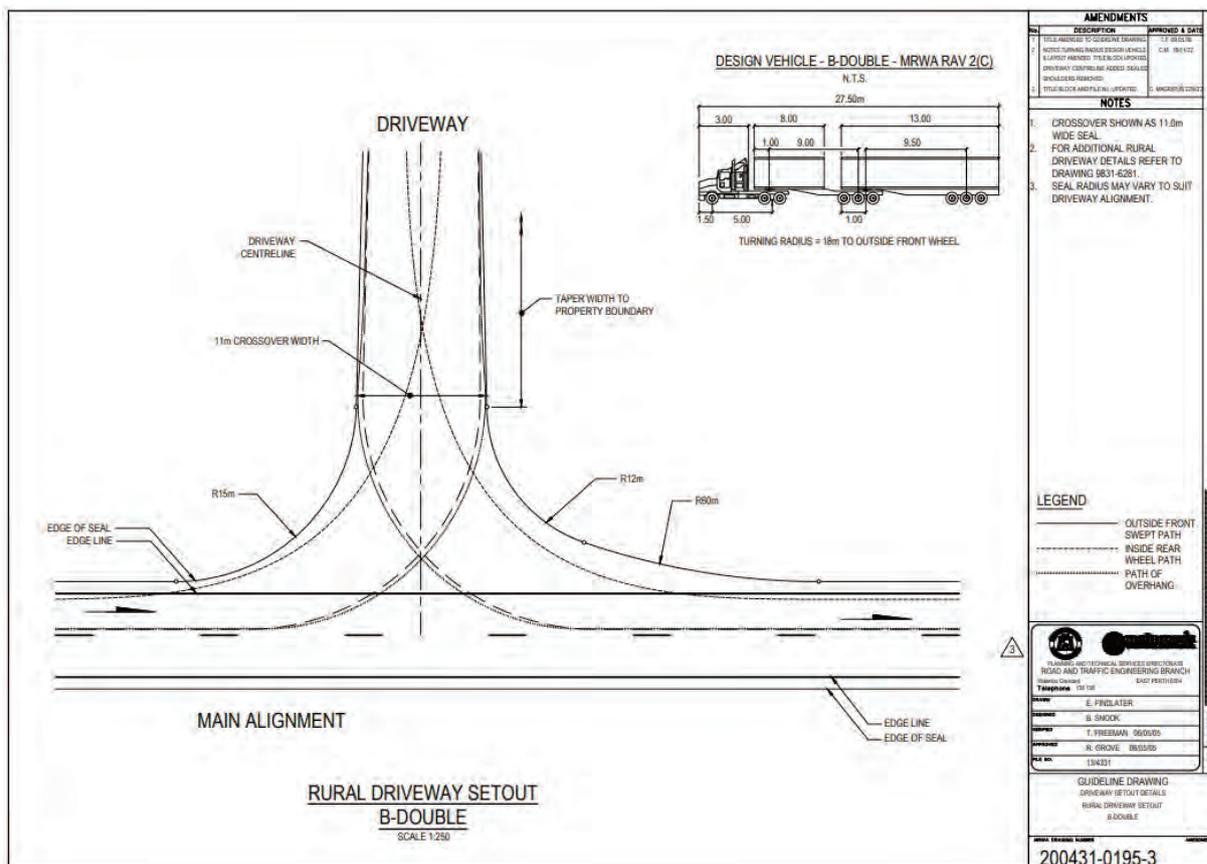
Main Roads WA layout details for a rural driveway (B-Doubles up to 27.5 m)
